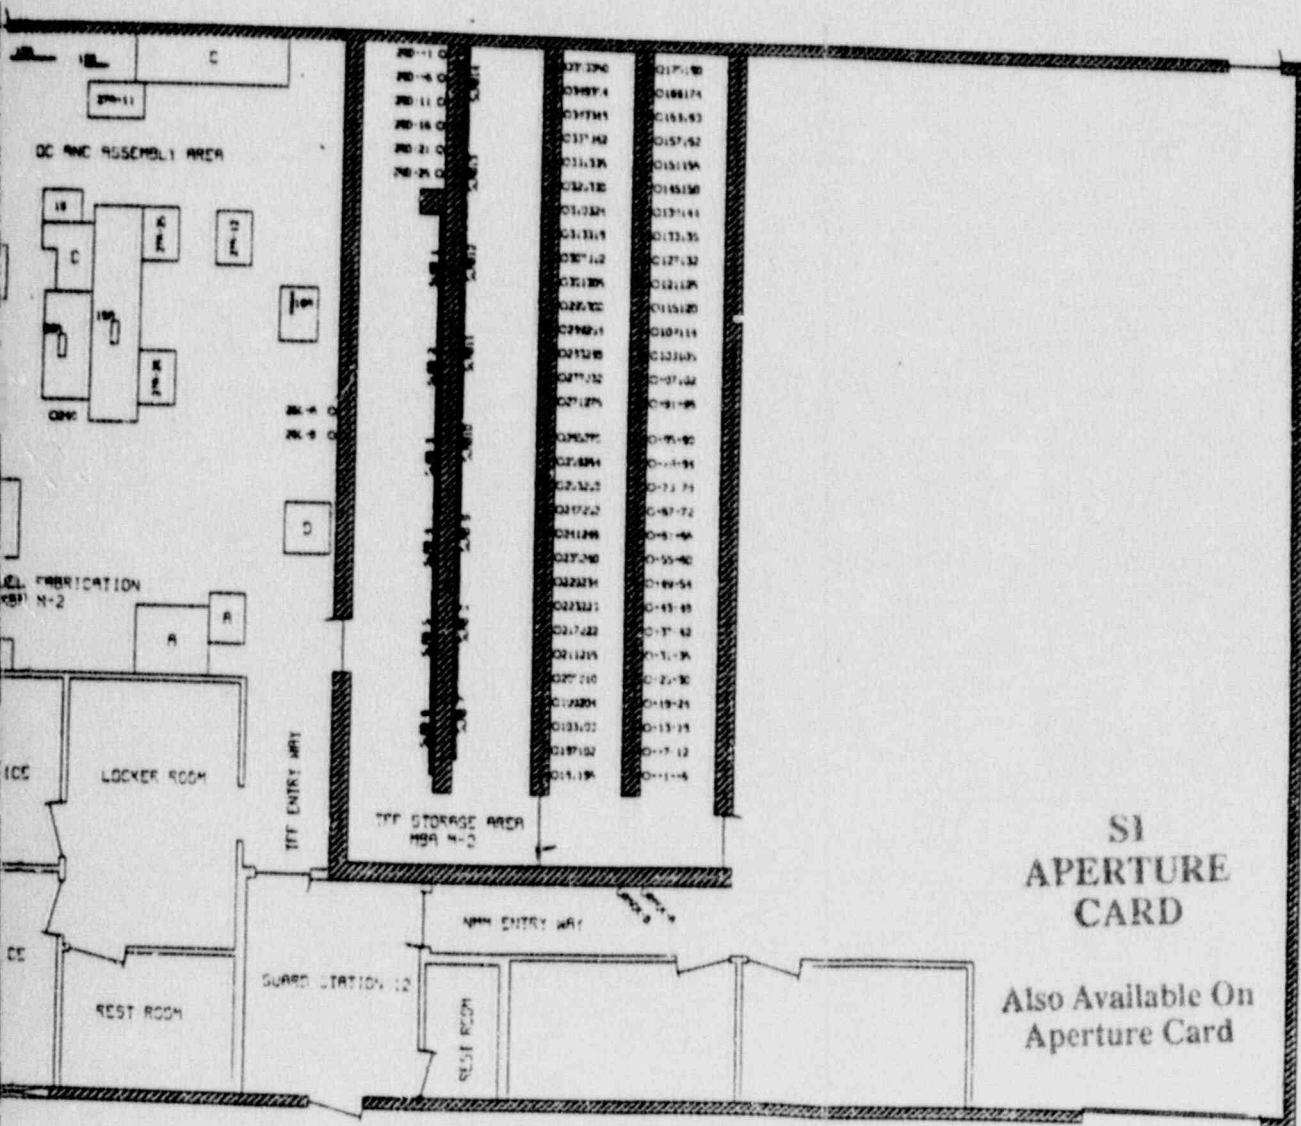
TRIGA Fuel Fabrication Building
